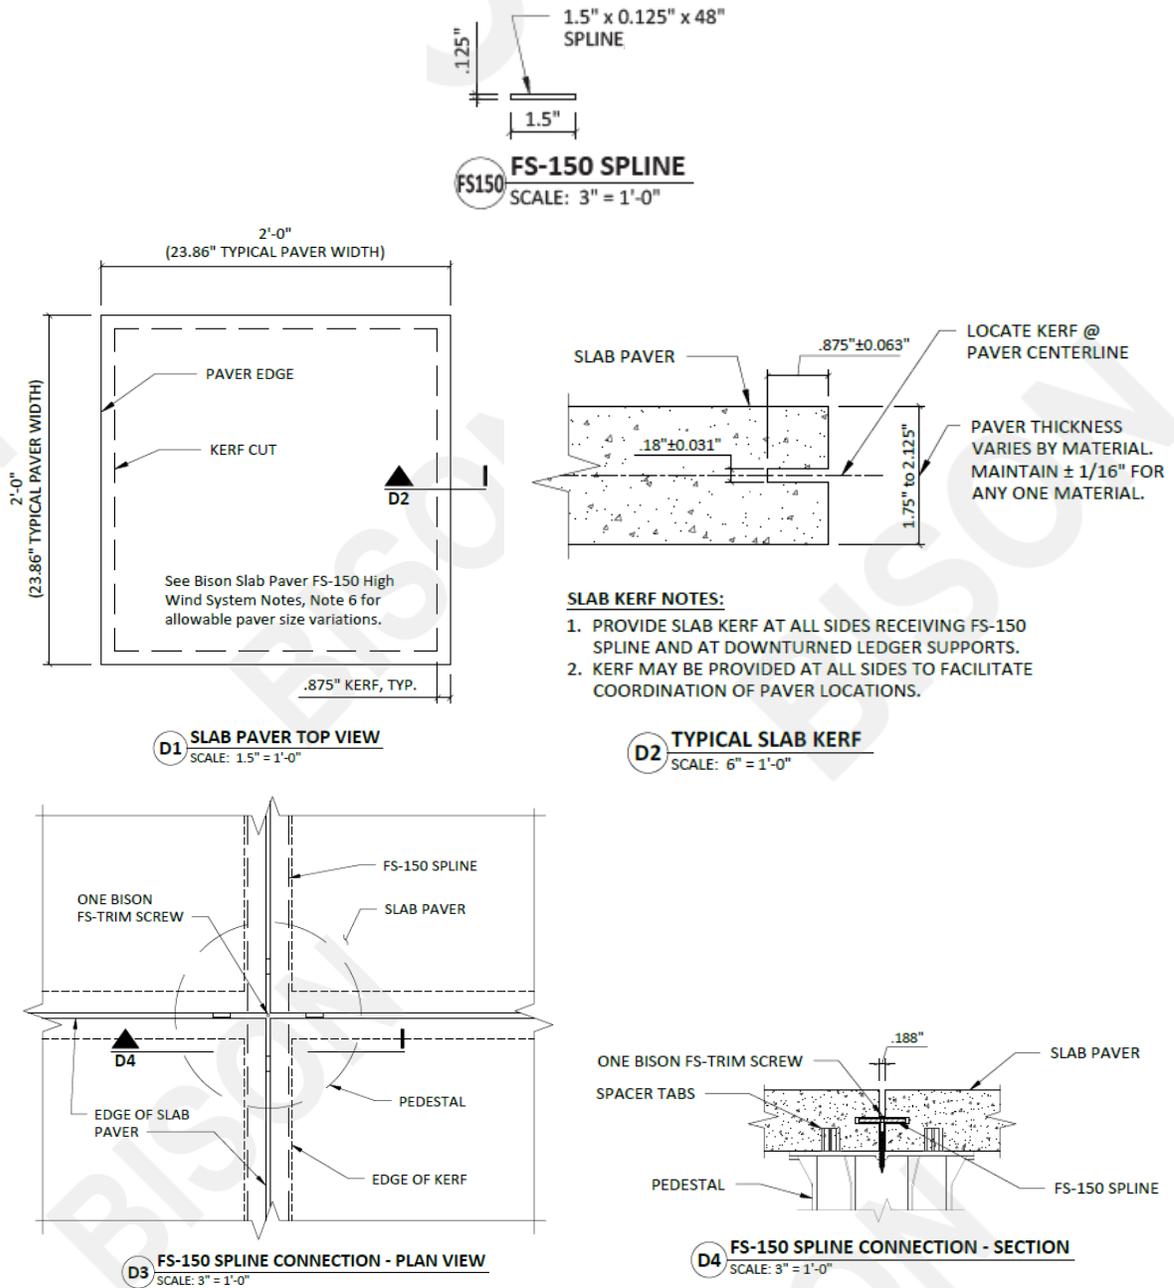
B – FS-150 SPLINE CONNECTION DETAIL FOR BISON CONCRETE / STONE SLAB PAVERS ONLY
